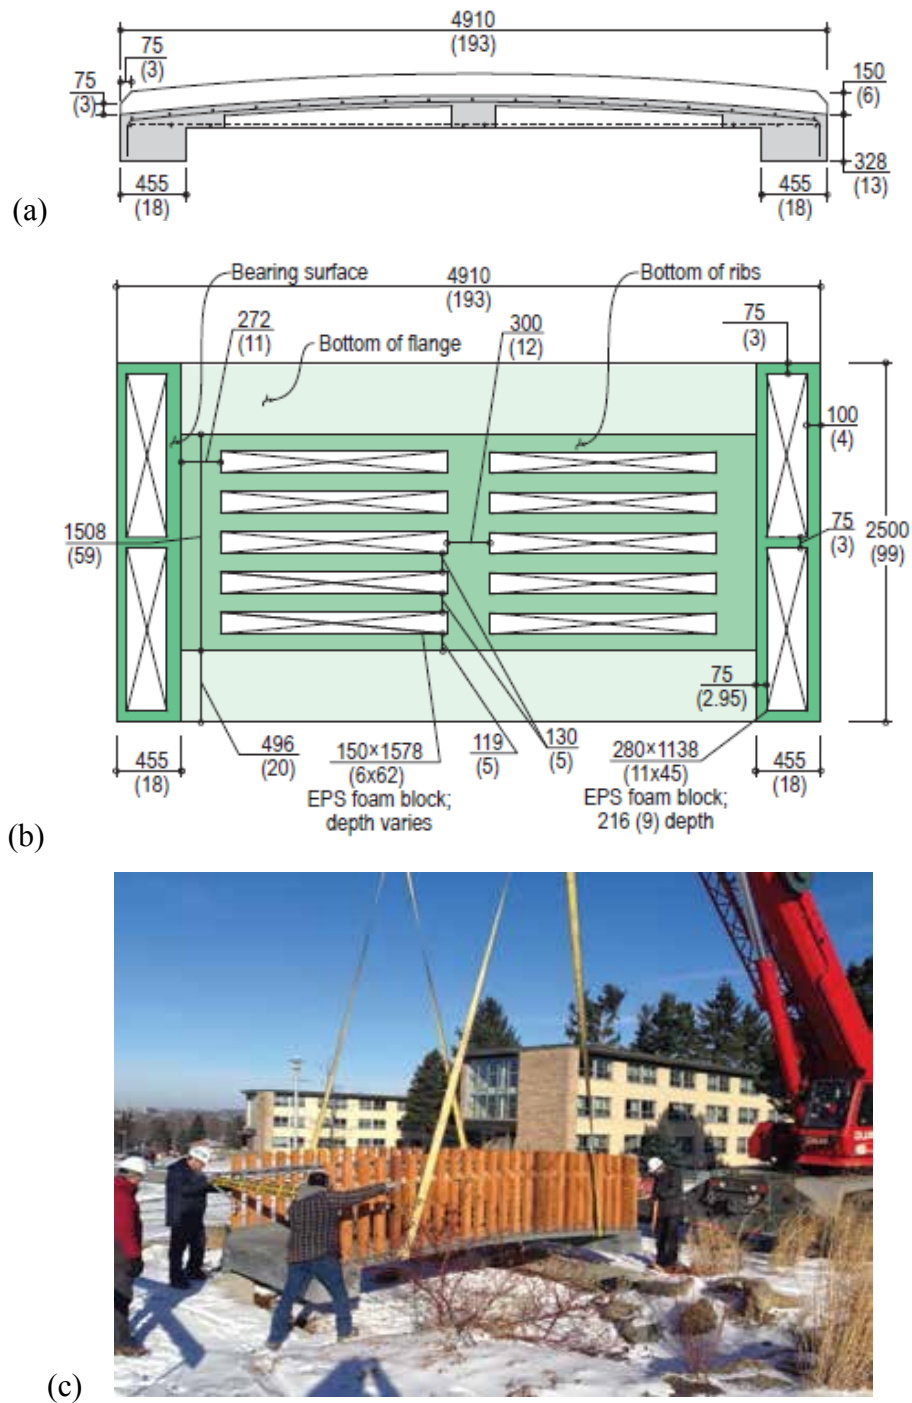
Bridge: (a) schematic longitudinal section at centerline, (b) bottom view showing concrete dimensions in mm (nearest in.), and (c) installation in the site
